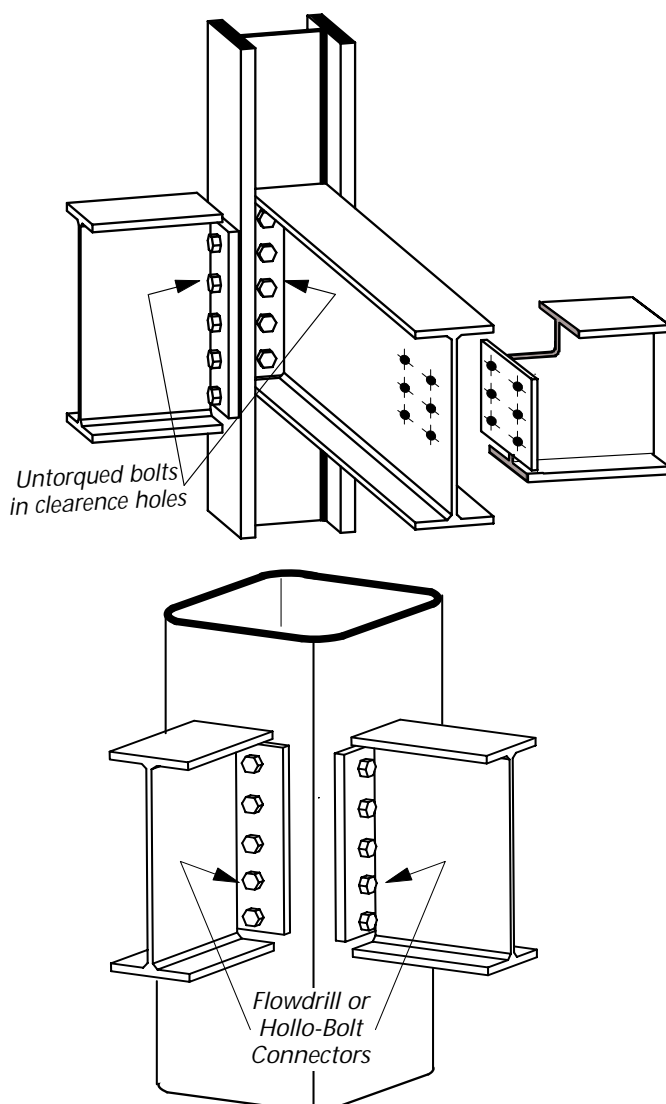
Flexible end plate. Beam-to-column and beam-to-beam connections
